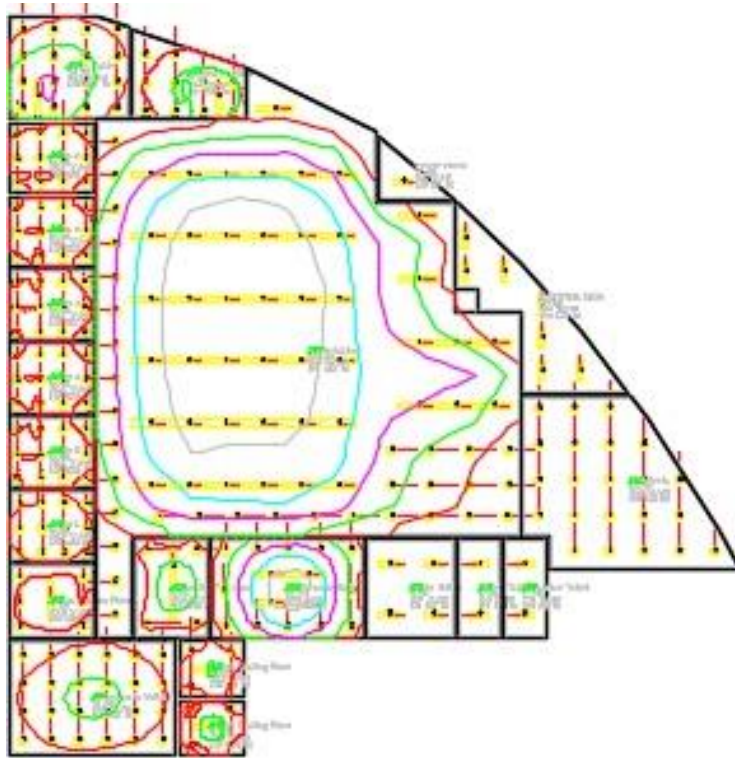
Lighting plan of Office B_bangalore with Conventional Layout
